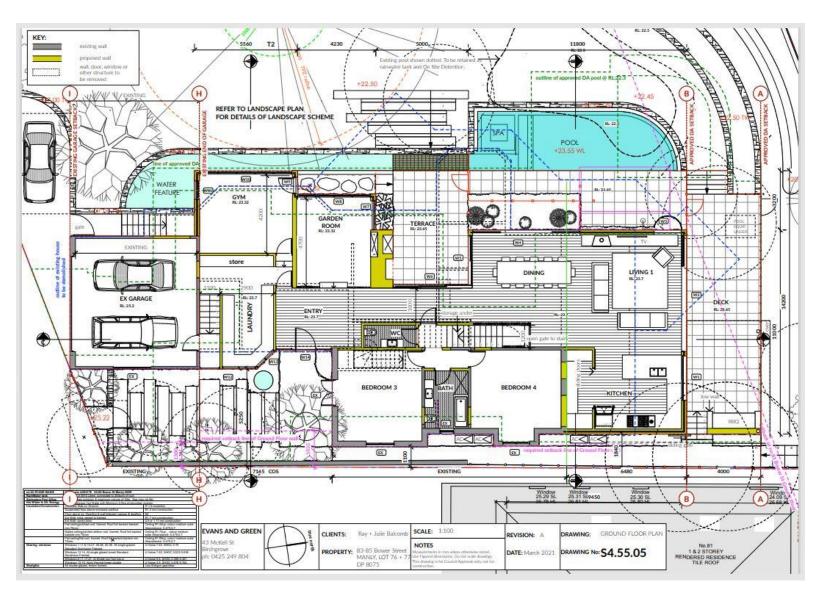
B - Ground floor plan of proposed amended dwelling house (for detail see final revised architectural plans from Evans & Green 2021)
